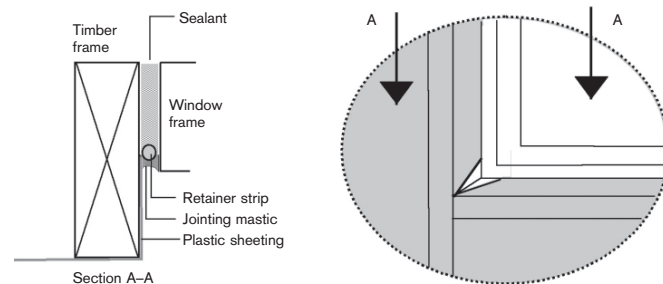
The left-hand drawing shows a section through a timber frame and a window frame. The plastic sheeting from the wall is folded into the reveal and sealed in place using jointing mastic between the two frames. The right-hand drawing shows how the plastic sheeting has been cut in one of the corners so that it can be folded into the reveal. This leaves a small area unprotected. To prevent any air leakage, extra strips of plastic sheeting are glued into the corners. [Mattsson and Sandberg, 2005]
